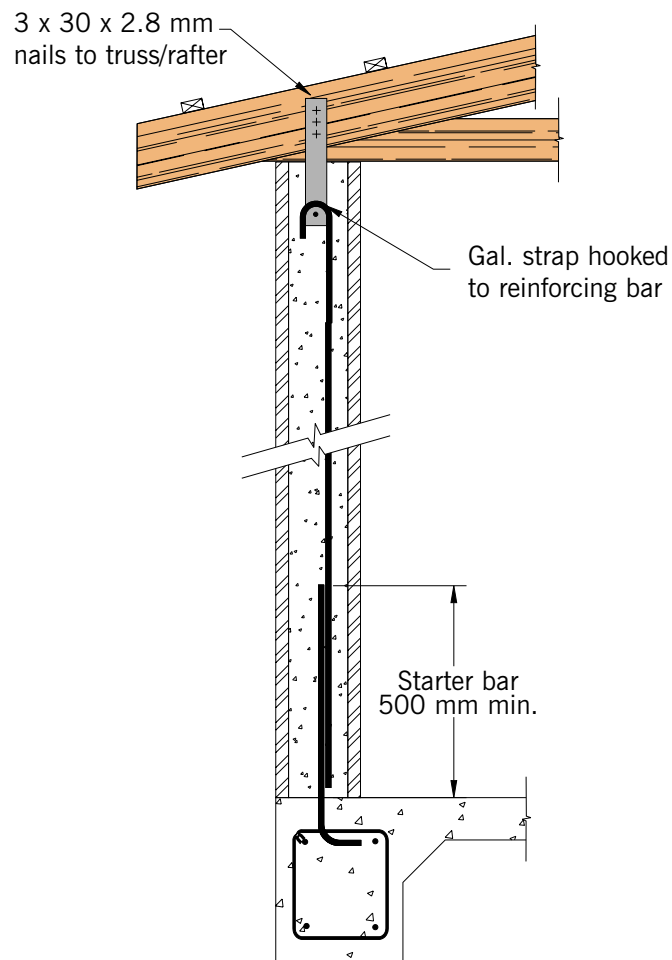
Roof tie-down - cavity wall (high wind - not cyclonic)
